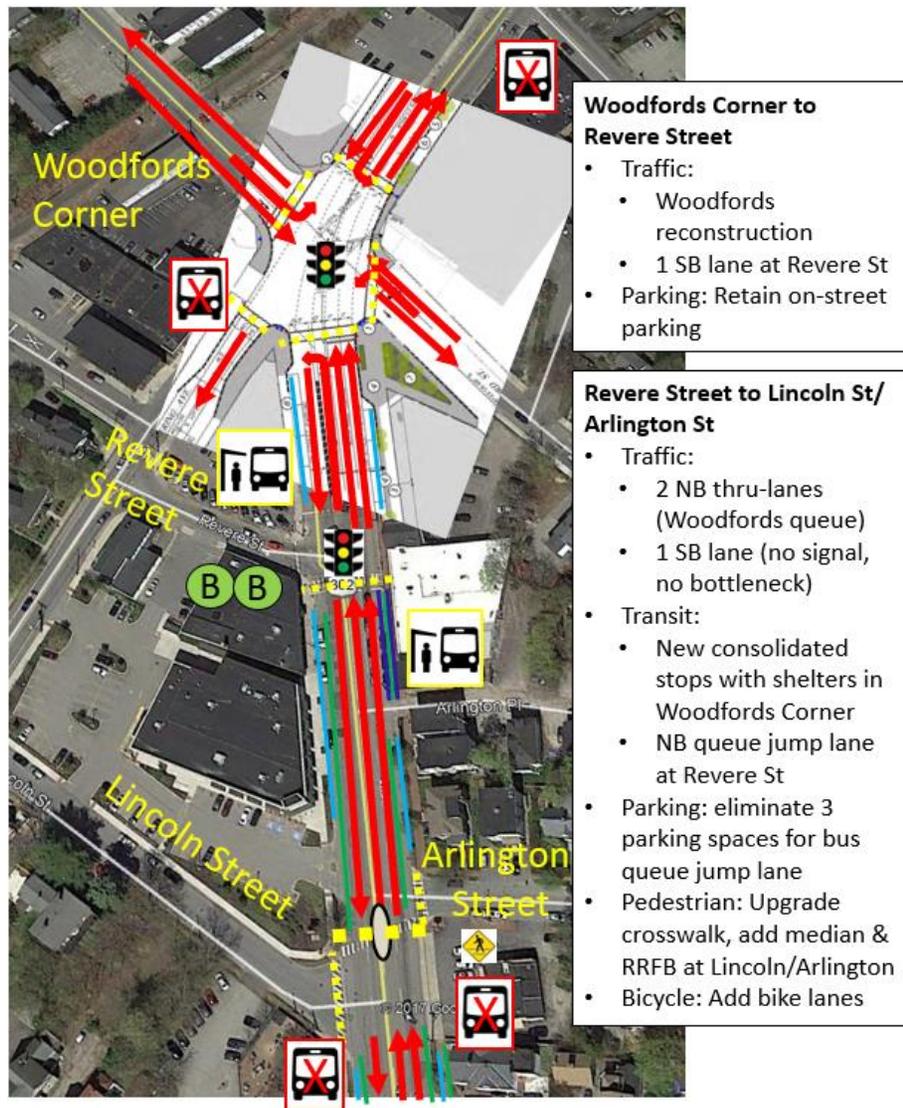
Woodfords Corner to Lincoln Street/Arlington Street – Alternative 1
